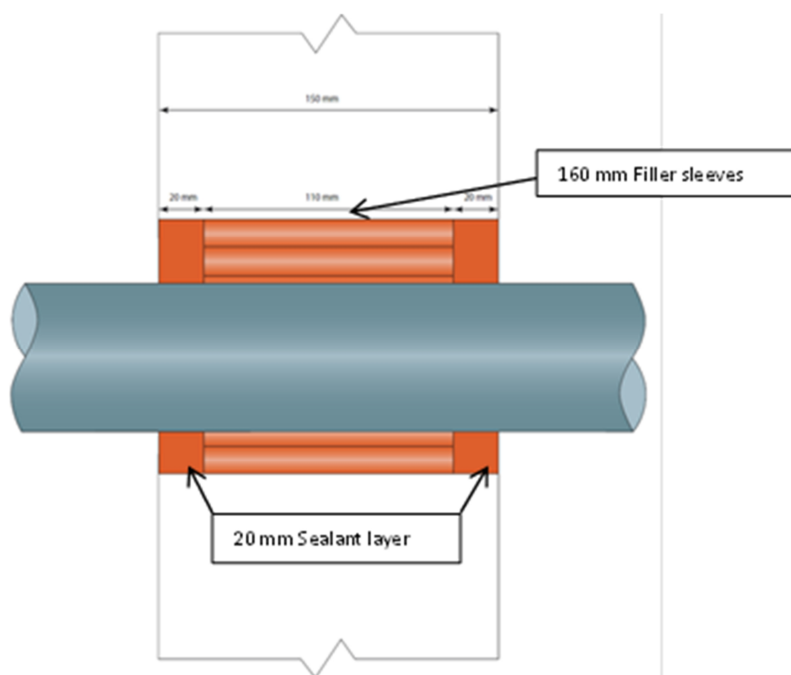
NOFIRNO pipe transit sealing system in a wall with a thickness of 200mm.
